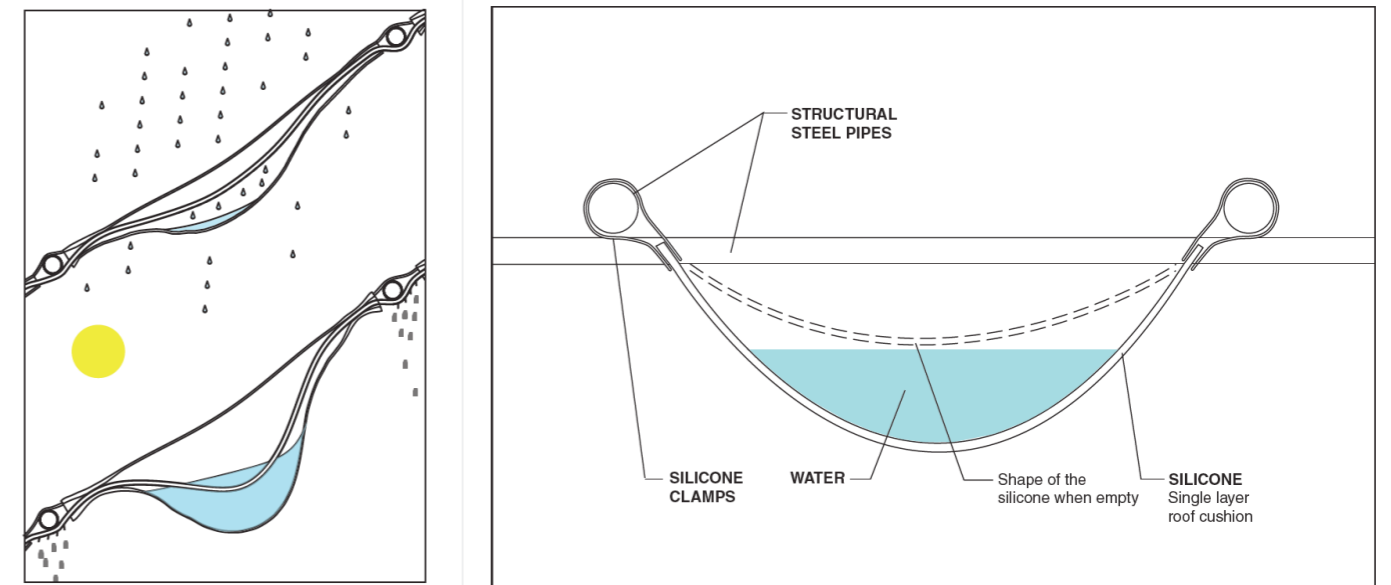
Details of the roof design showing the silicon layers and dripping process
